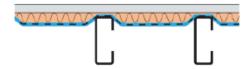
Figure A. Flat metal roof with no ceiling with continuous roll form foil blanket.
